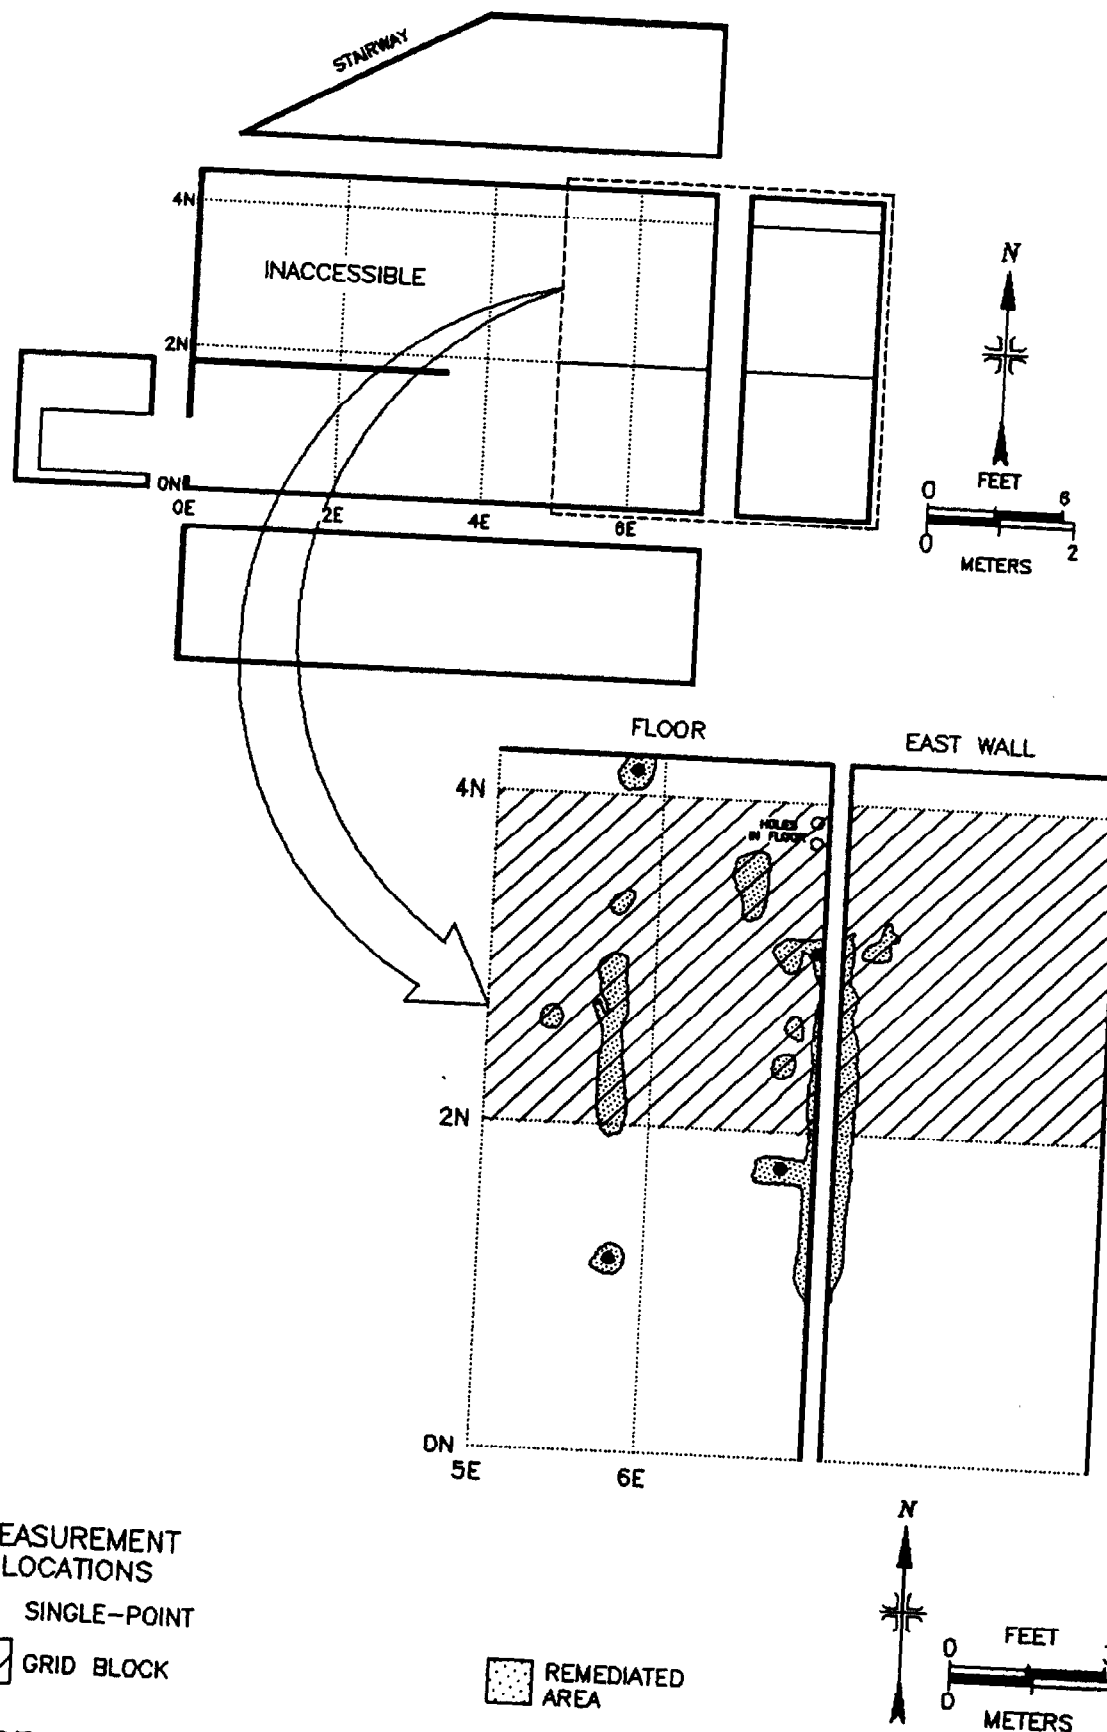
Building 1, Room 119 – Measurement Locations on the Floor and East Wall
